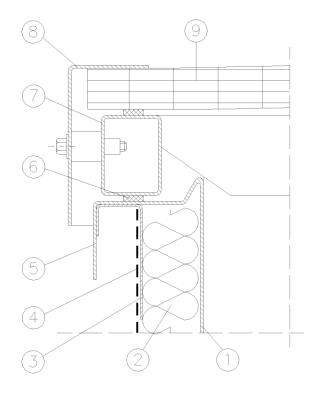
ITEM A: PVC membrane or roofing paper sealing method.
